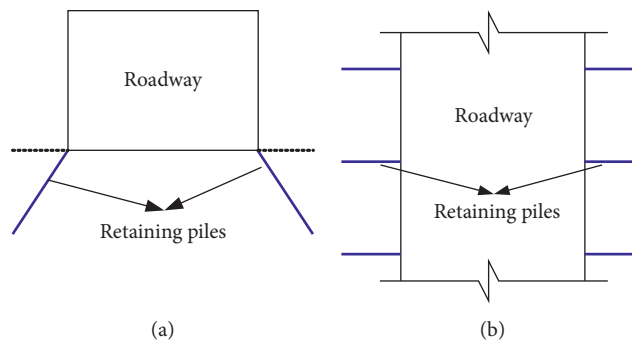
Indication diagram of retaining pile arrangement. (a) Sectional drawing; (b) vertical view.
